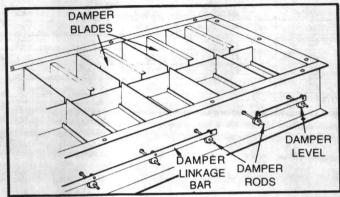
A - Setting the Zone Damper Rods and Damper Linkage
